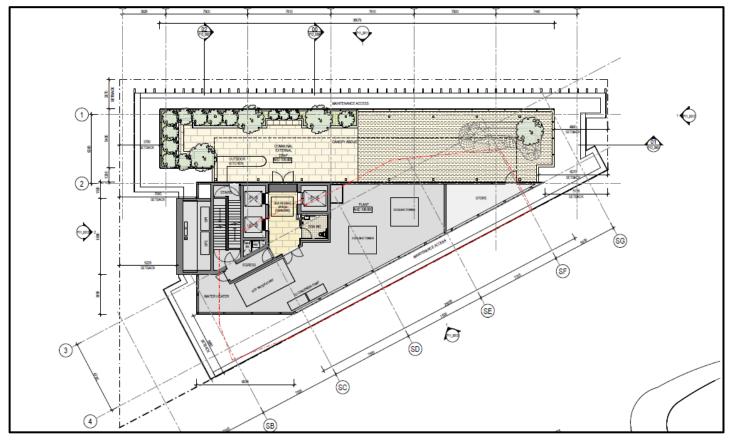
Excerpt from Level 24 Floor Plan (roof-top terrace level) (S.57A Amended Plans)
